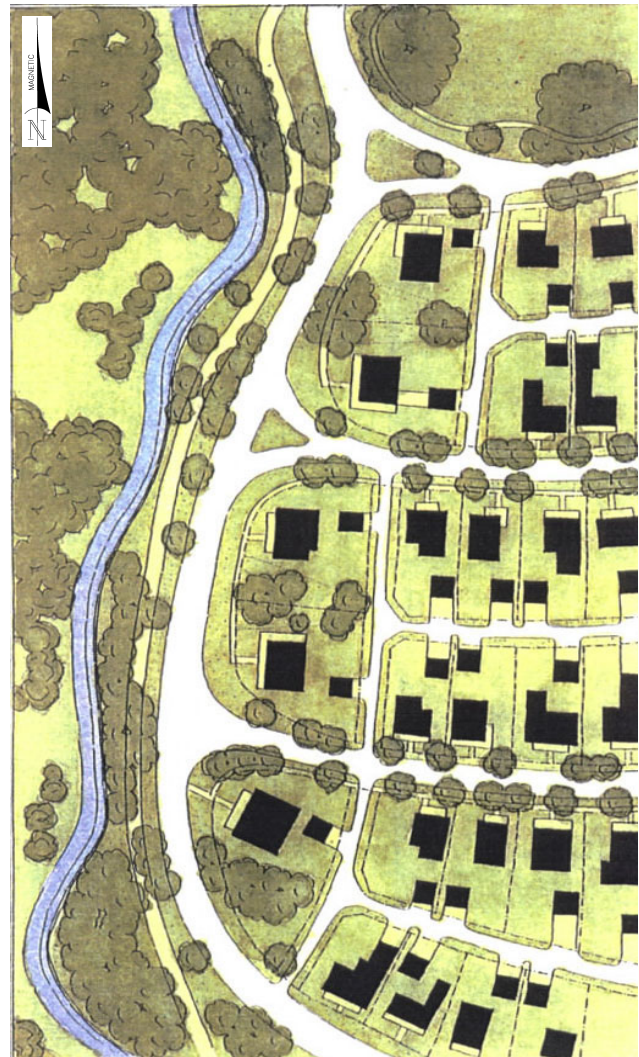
T-3 Site-Specific Plan by DPZ & Co.
